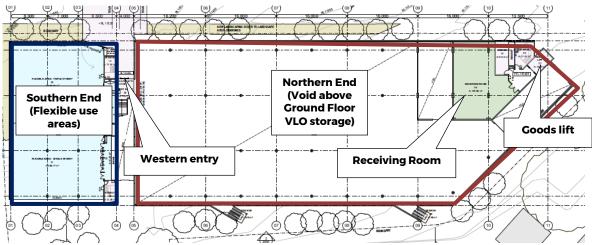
Building J Ground Floor Plan Source: Lahznimmo Architects
